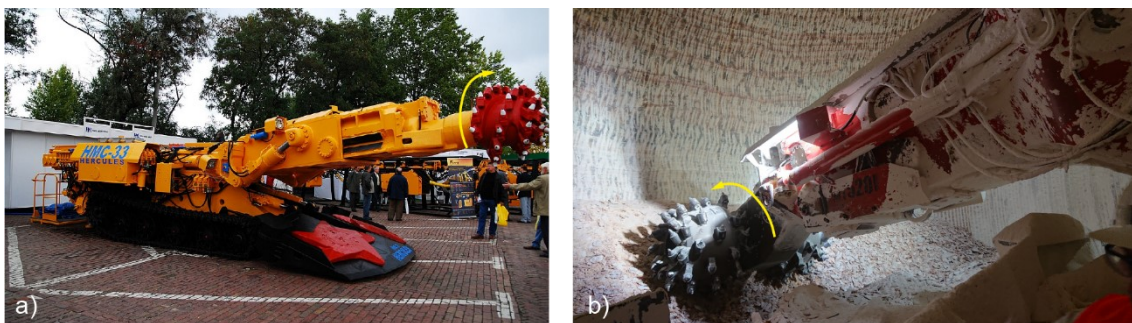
a) Roadheader with axial cutting head [223], b) transverse cutter<sup>19</sup>
